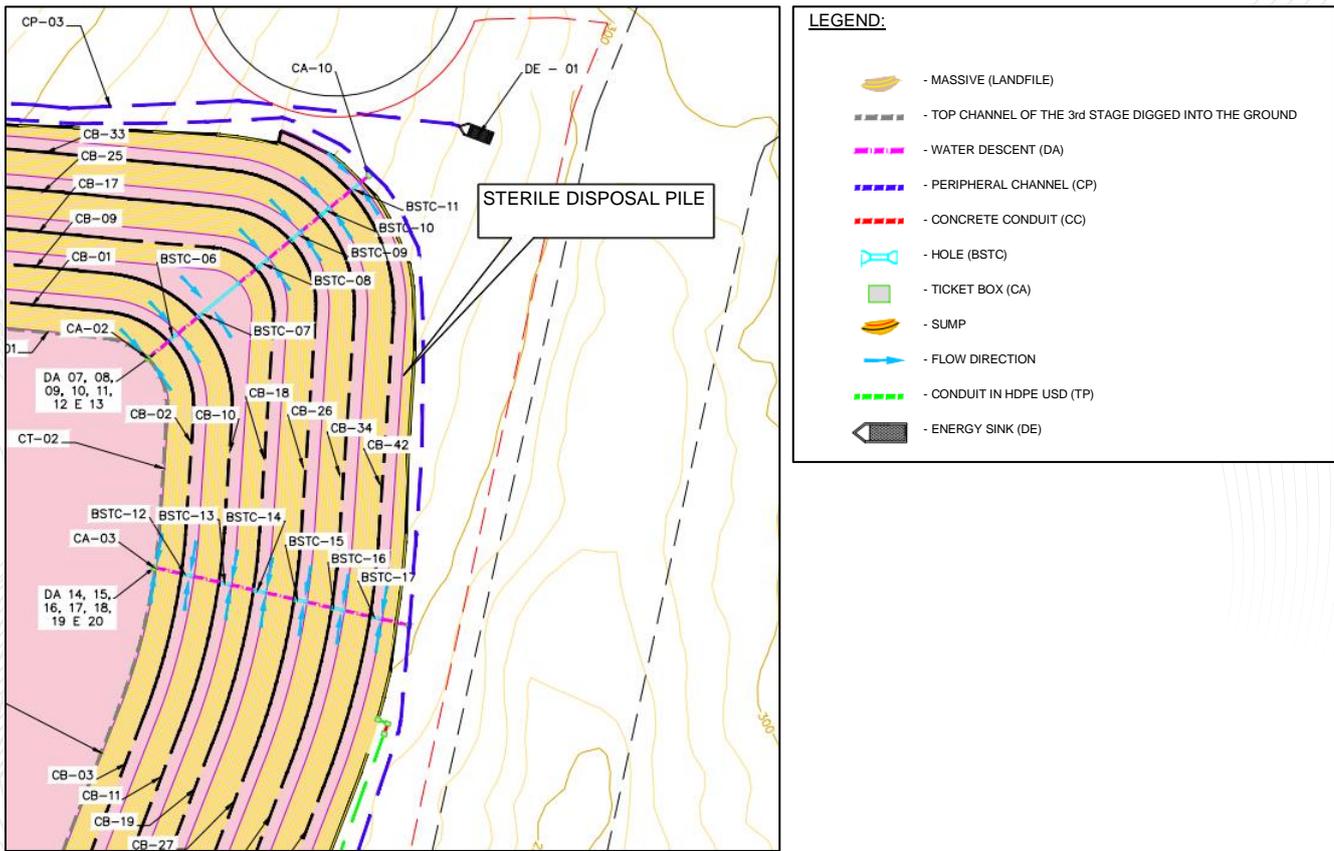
Detail Surface drainage sterile stockpile - PDE (GHT, 2022)
